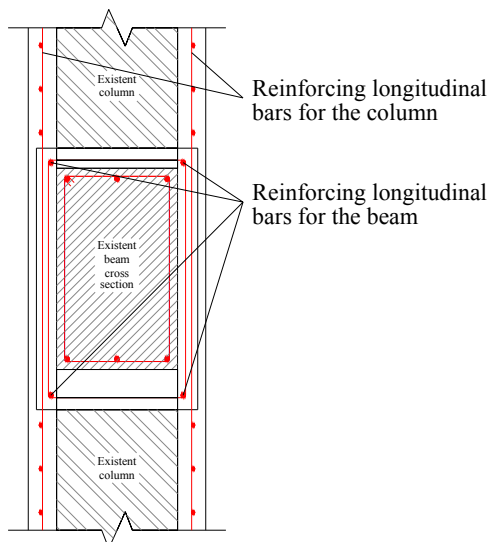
The continuity of the reinforcing bars of the beams was assured.
